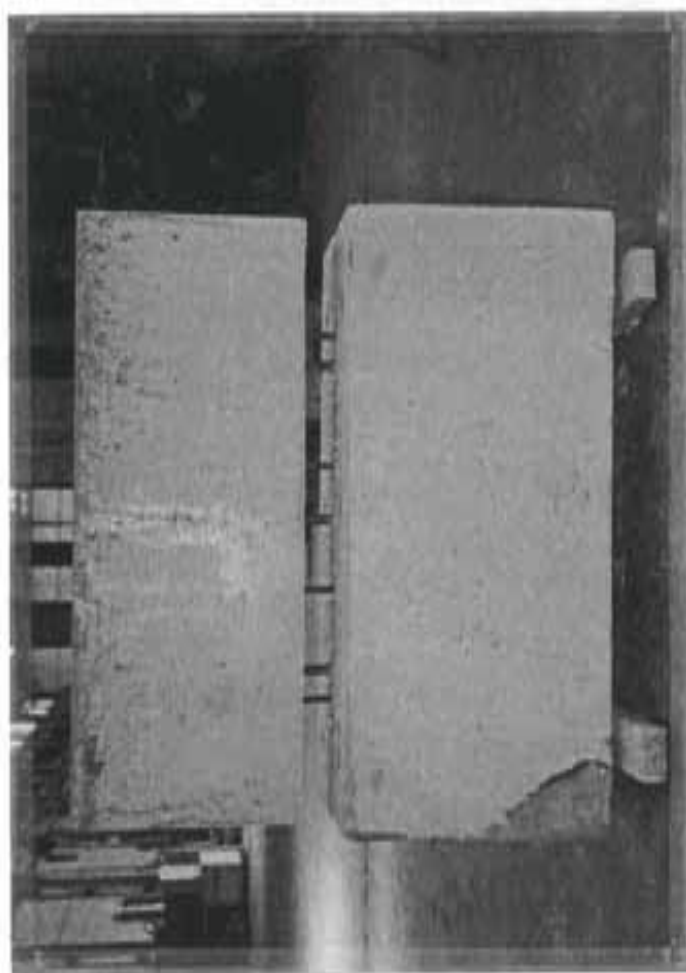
Gap in top frame-wall connection after casting frame and wall segments
